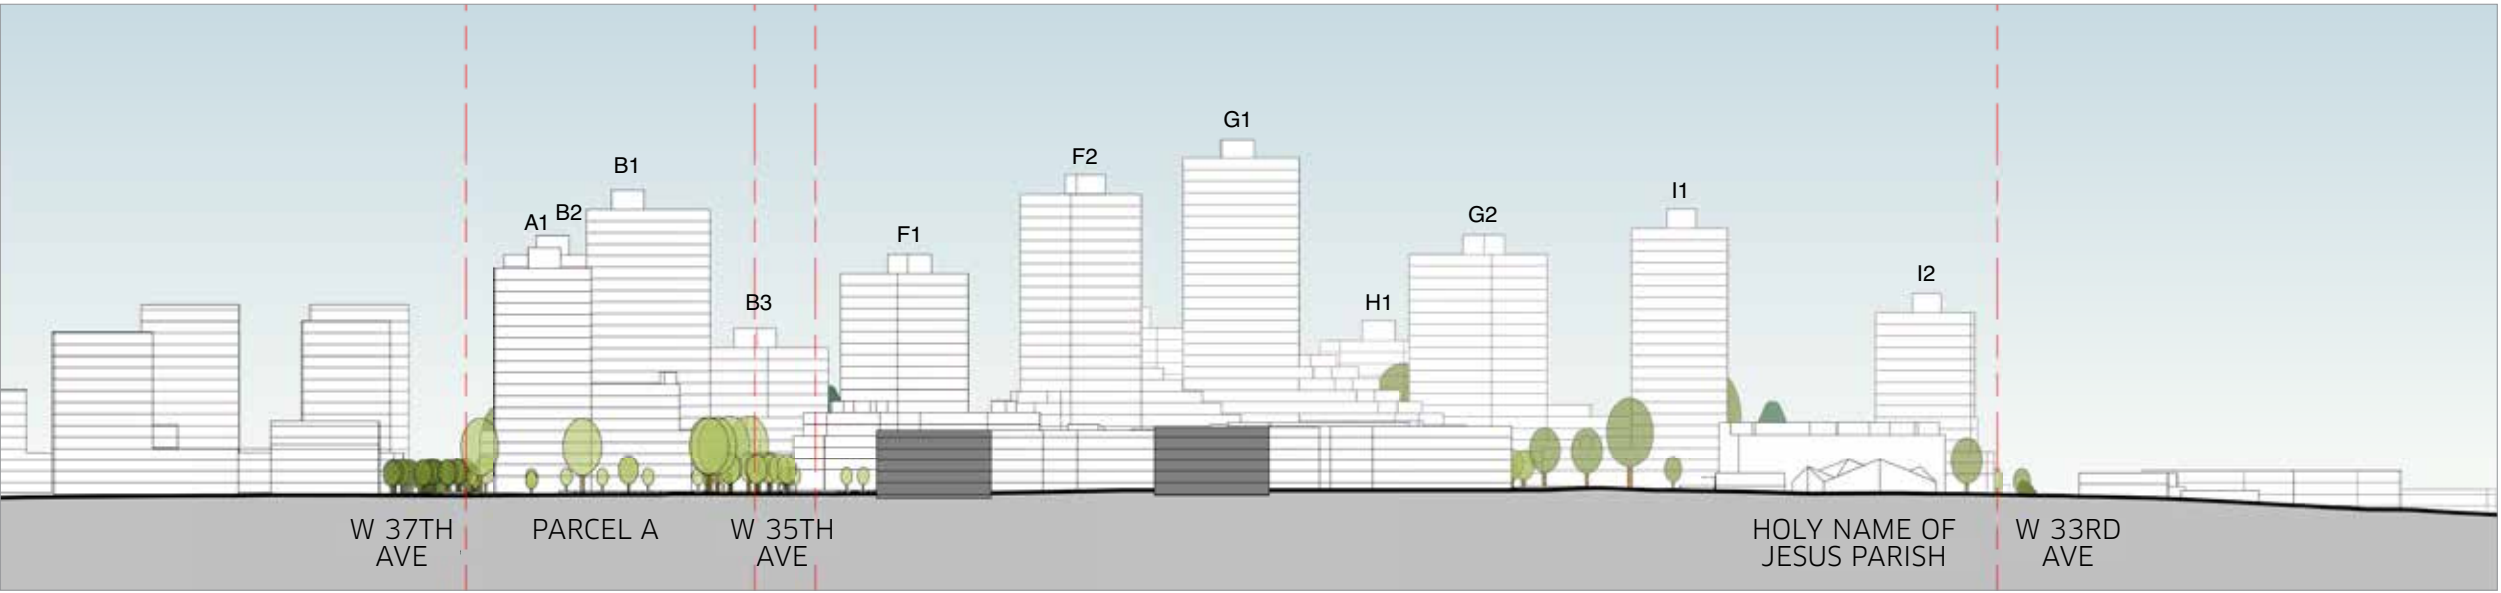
Lane East of Manson Street, Looking West Elevation B-B
